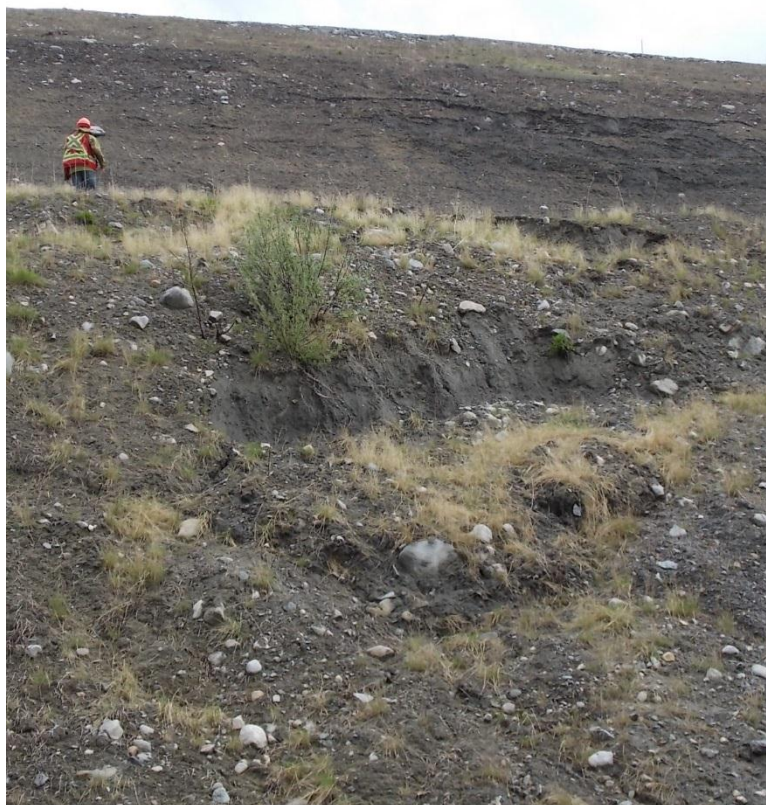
Gullies on the toe berm slope (June 13, 2013).
